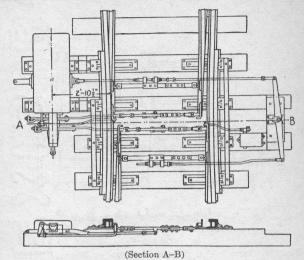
Movable Point Frog Operated by Model 4 Switch Machine
